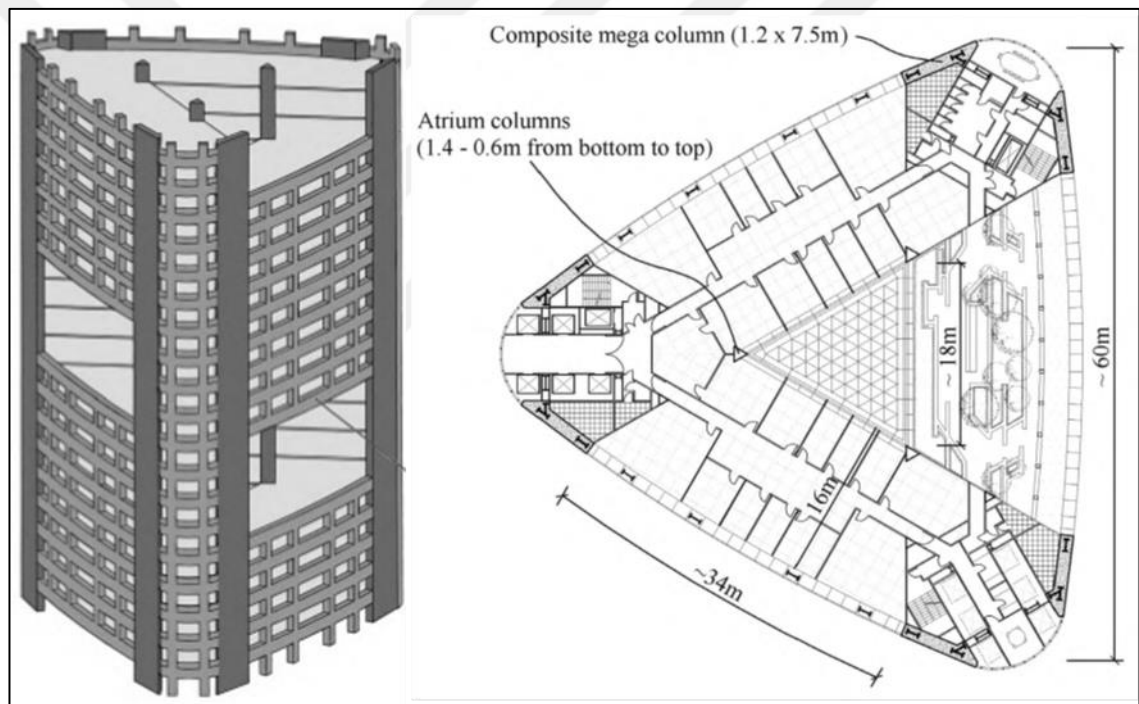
The plan and the structural system of Commerzbank Tower (Günel and İlgin 2014)
